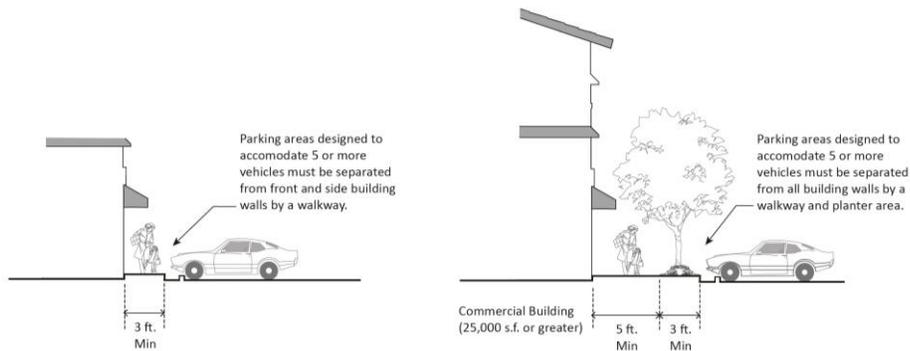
(M): PARKING SEPARATION FROM ON-SITE BUILDINGS
